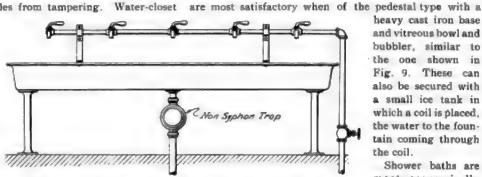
Detail of Plumbing for Wash Sinks in Second Class Buildings
